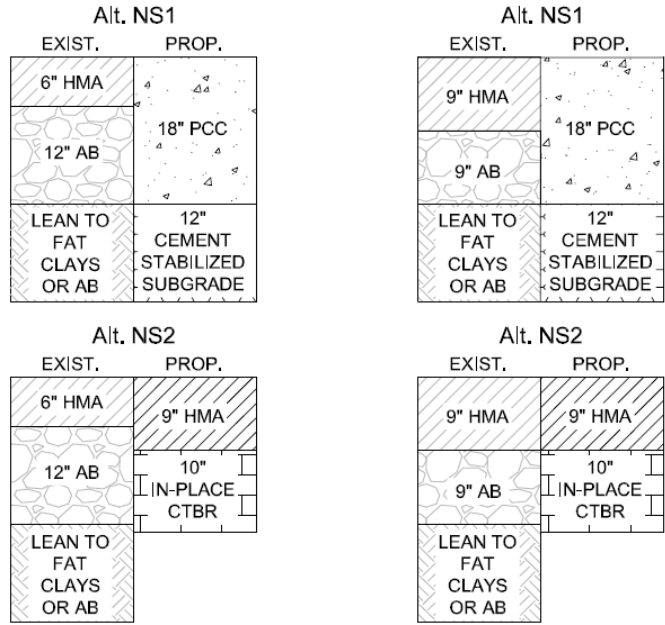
Alternative Nonstandard Cross Sections for the Asphalt and Concrete Pavements
